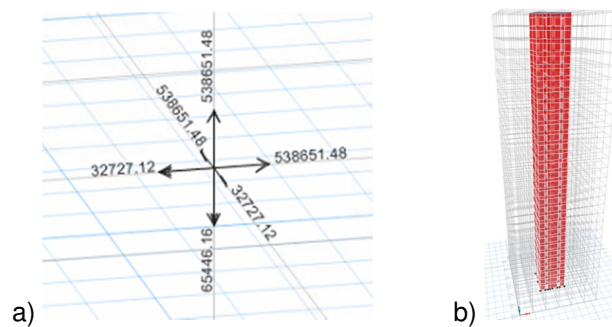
a) Additional mass & MOI to core at each floor level; b) Concrete core LLRS)
